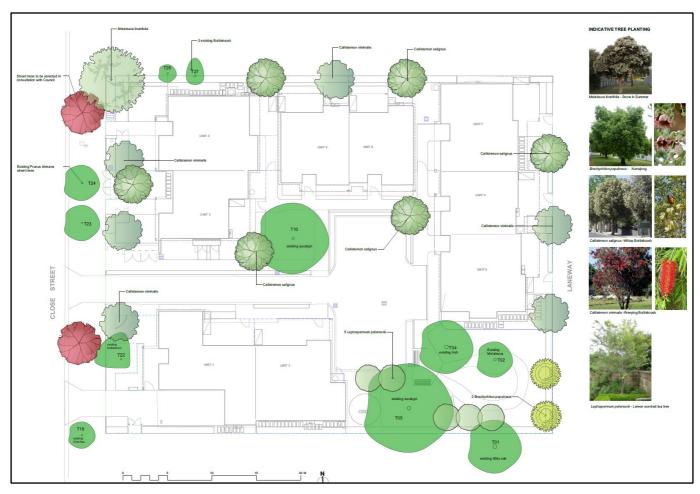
Extract from Landscaping Plans – GA Plan 4 of 4 (Source: Architectural Plans, Lindy Lean Landscape Architects, dated 30/11/2023)
